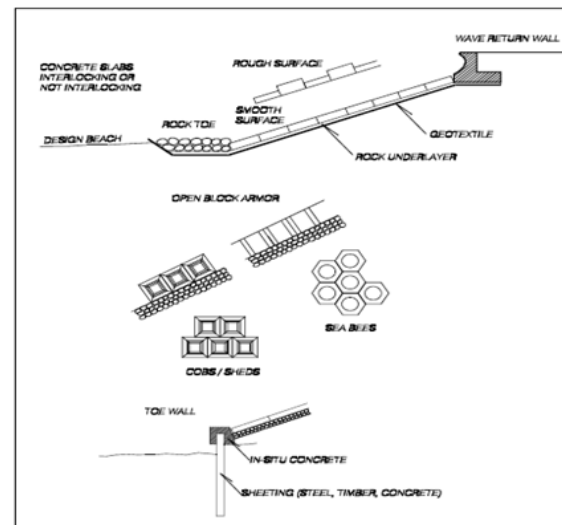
Examples of sloping-front seawalls/revetments with pattern-place concrete armor units
